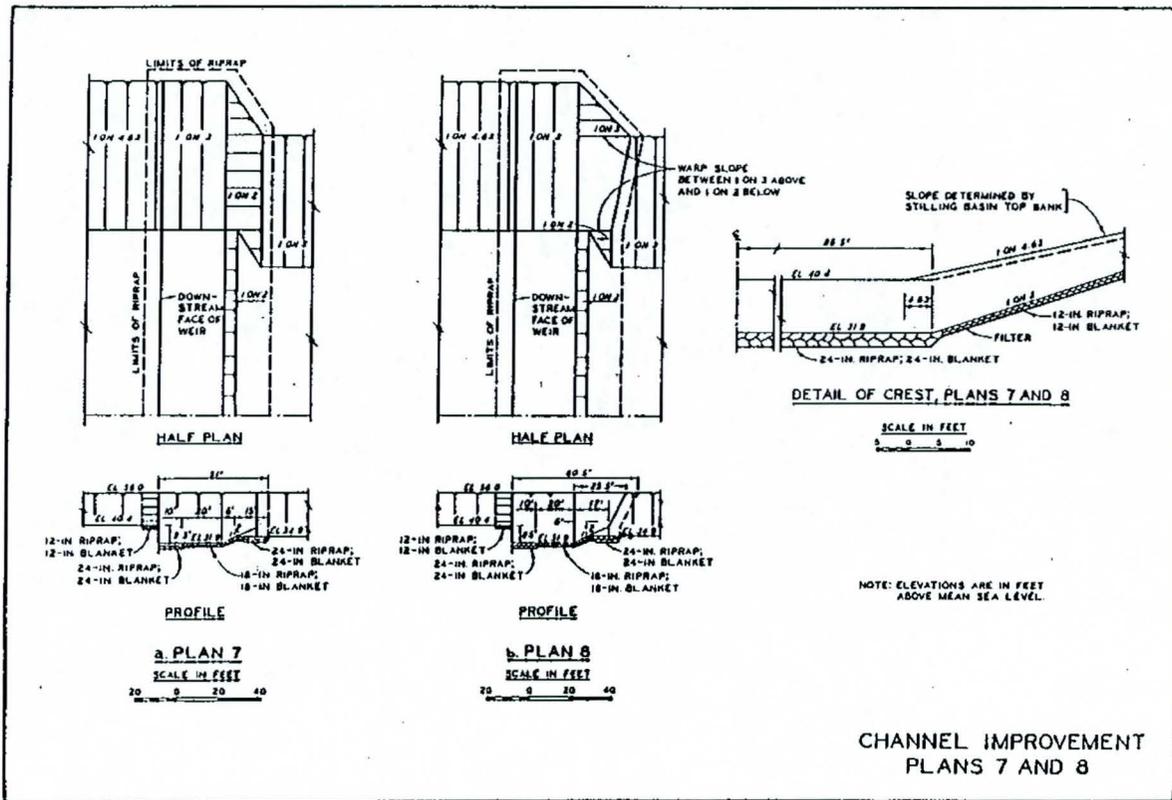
Channel-improvement plans using low-water weirs (after Ables and Boyd 1969).
